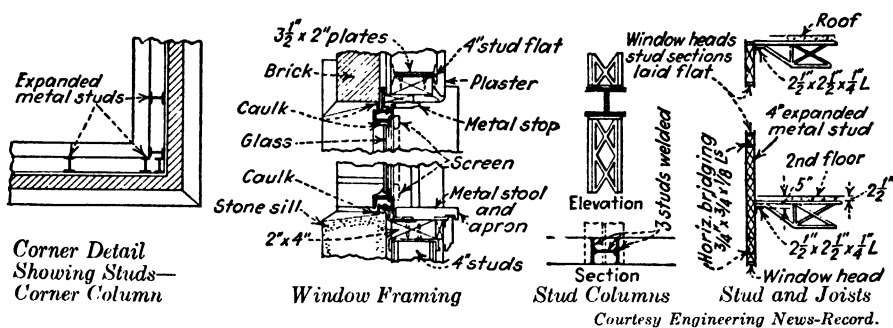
DETAILS OF BUILDING WITH EXPANDED METAL JOISTS AND STUDS.
